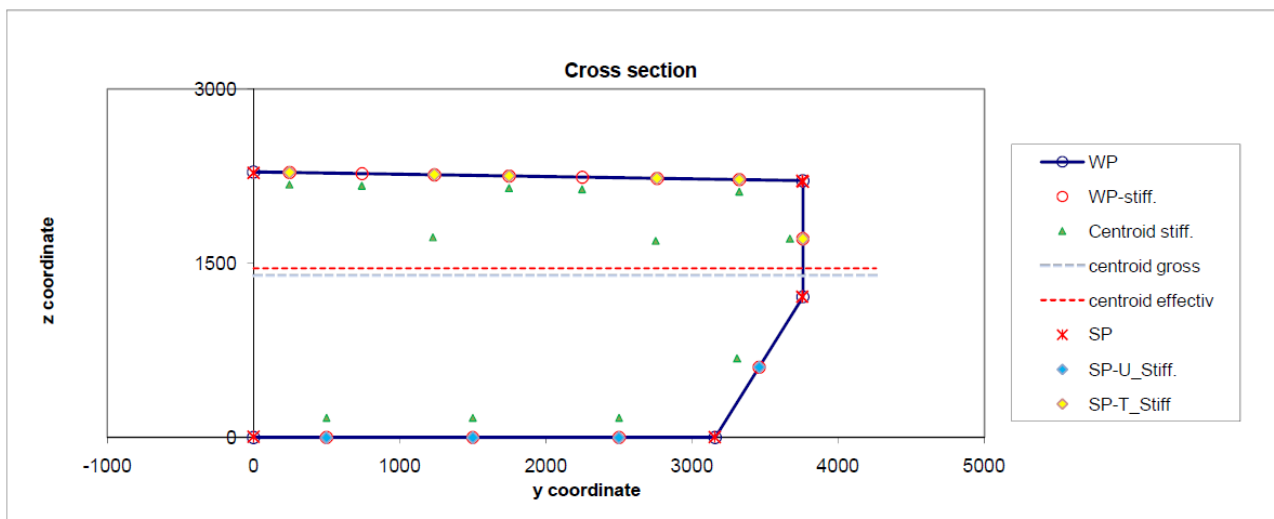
Cross section layout in ADVERS for the railway girder type CF1 and CF2
